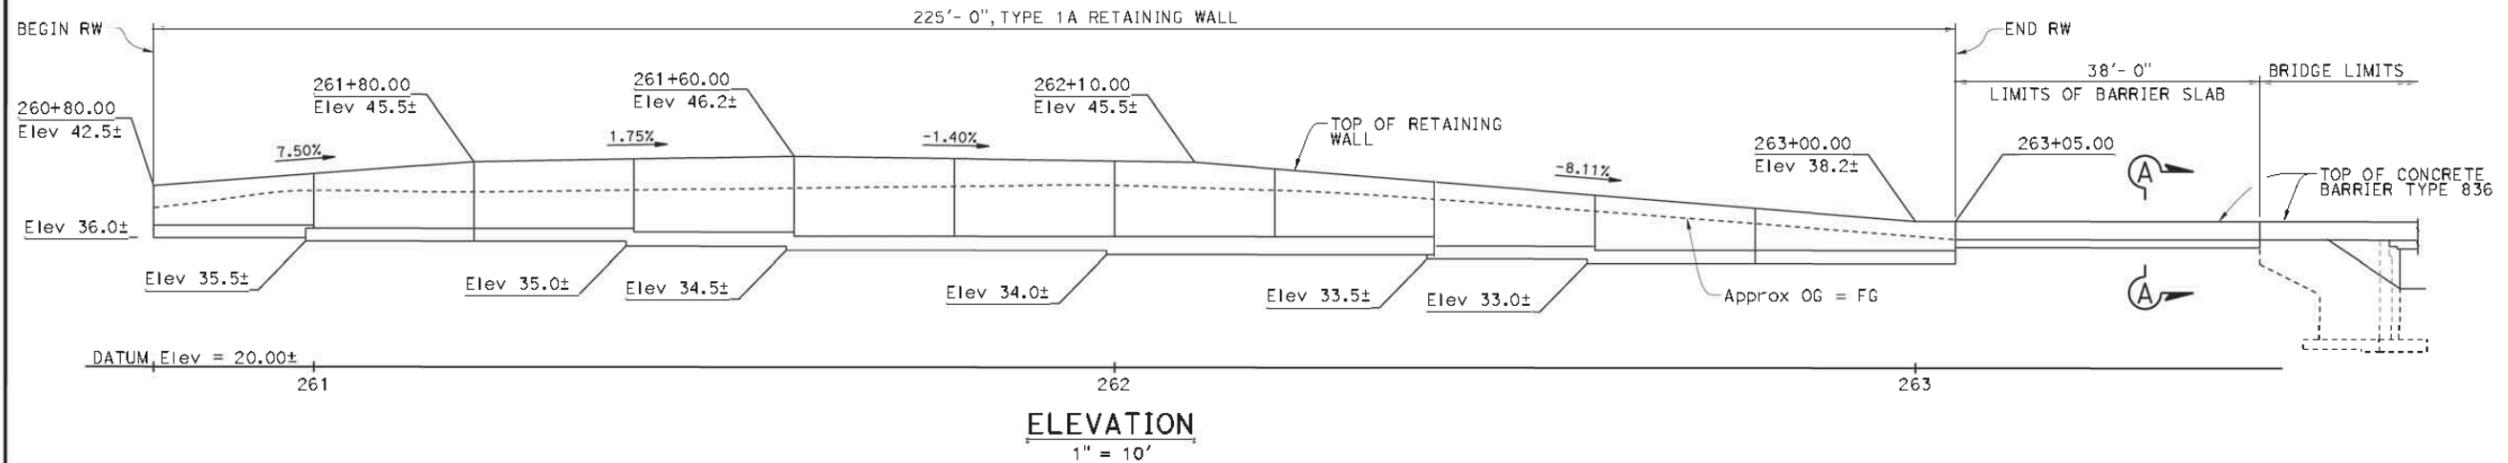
Build Alternative 1 Signalization - Retaining Wall SHEET 2 OF 2
